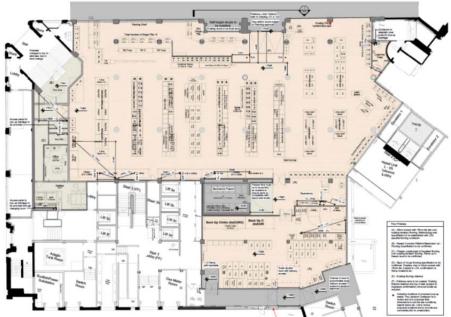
Extract of proposed floor-plan of the LIDL unit
